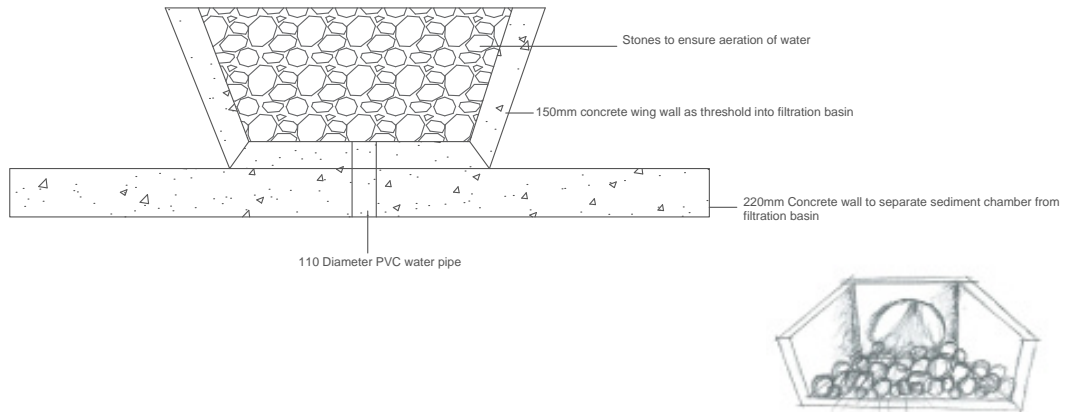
Detail section d - storm water outlet into detention dam (Author, 2018)
